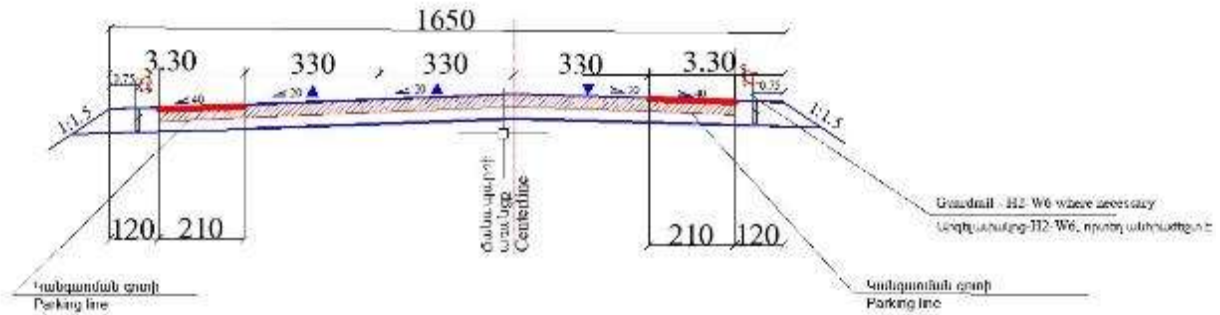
Typical Cross Section for 3 Lanes, tunnel exit/entrance
